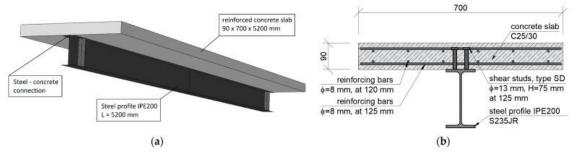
(a)Steel—concrete composite beam with a concrete slab on a steel I-beam, connected by shear study and (b) cross-section detailing materials and shear connectors.
